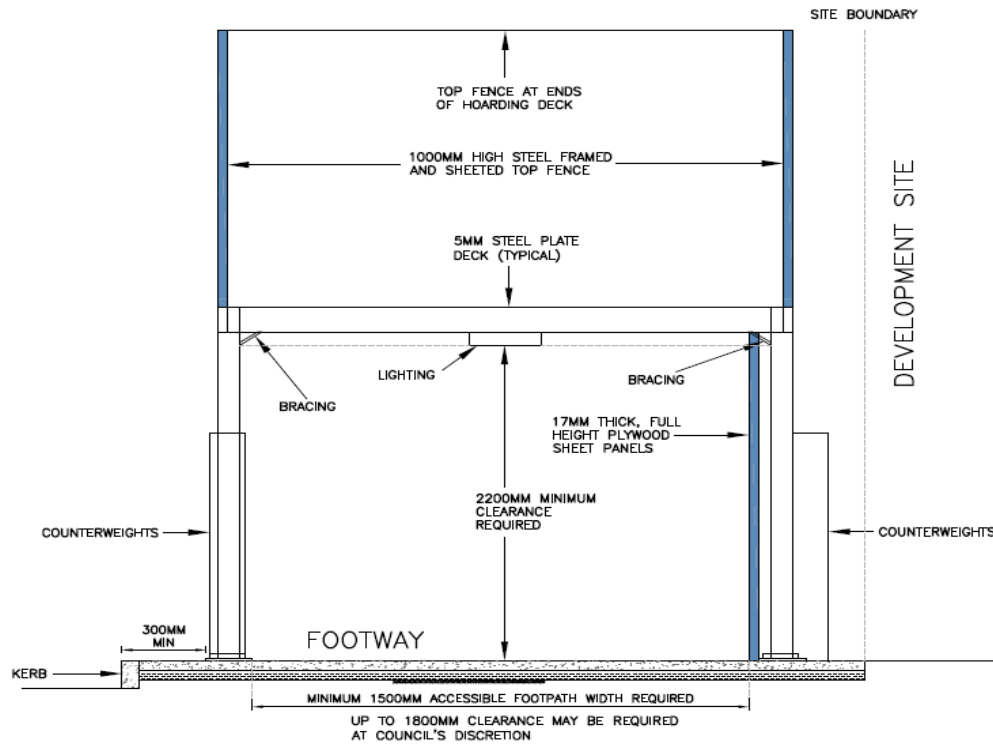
Diagram of Typical Cross Section for Type B Hoarding with full width concrete Footpath
